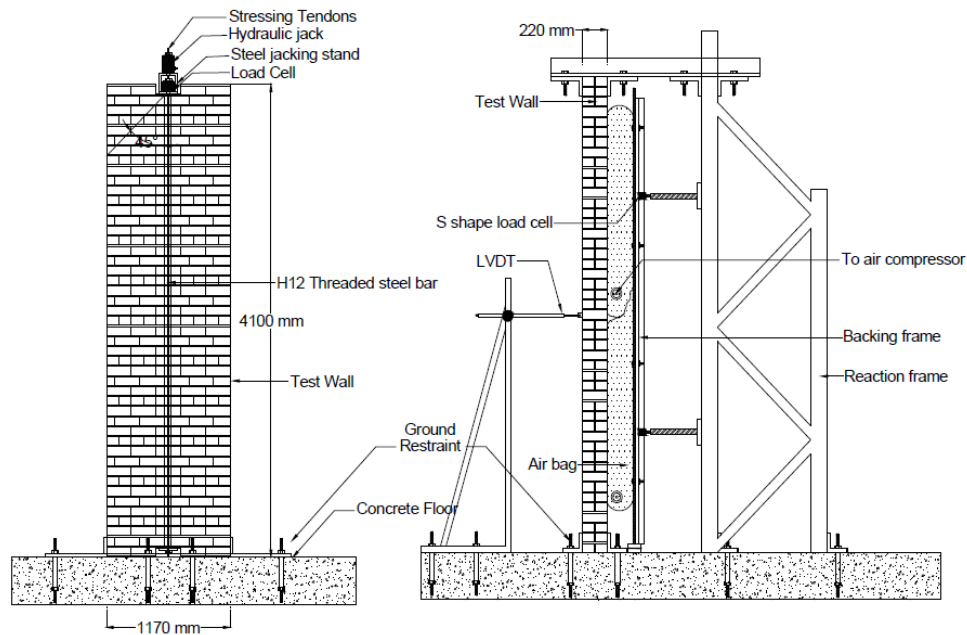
Test setup proposed by Ismail et. al. (2009)
